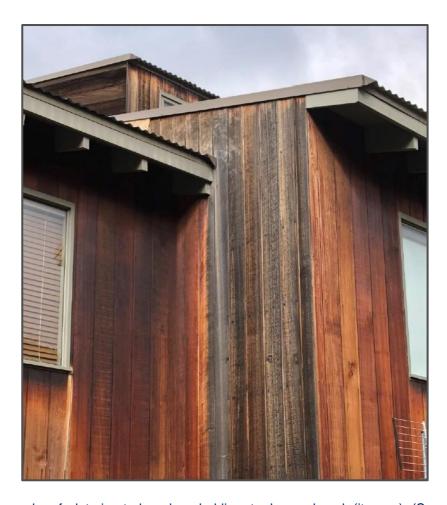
| Example of deteriorated cedar cladding to be replaced (item a) (Source: Applicant's documentation)
